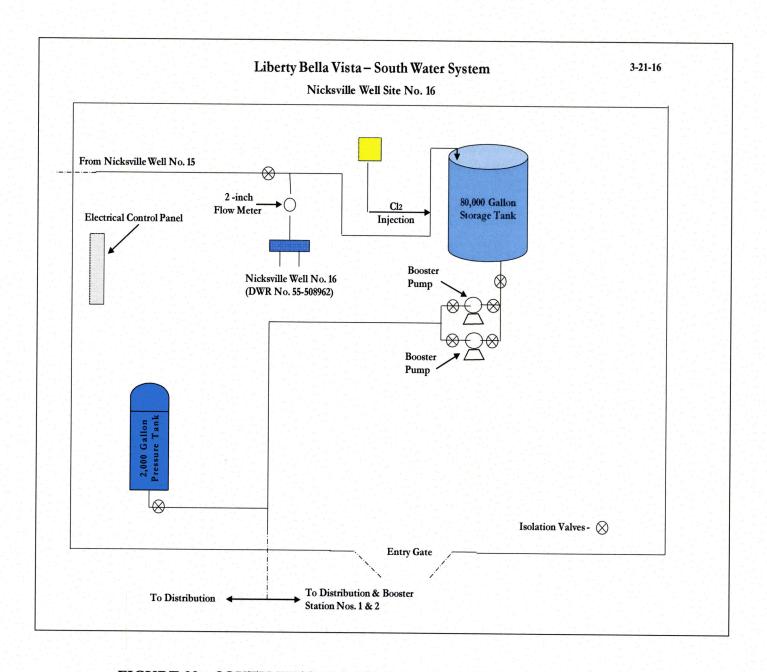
SOUTH WATER SYSTEM NICKSVILLE WELL SITE NO. 16
